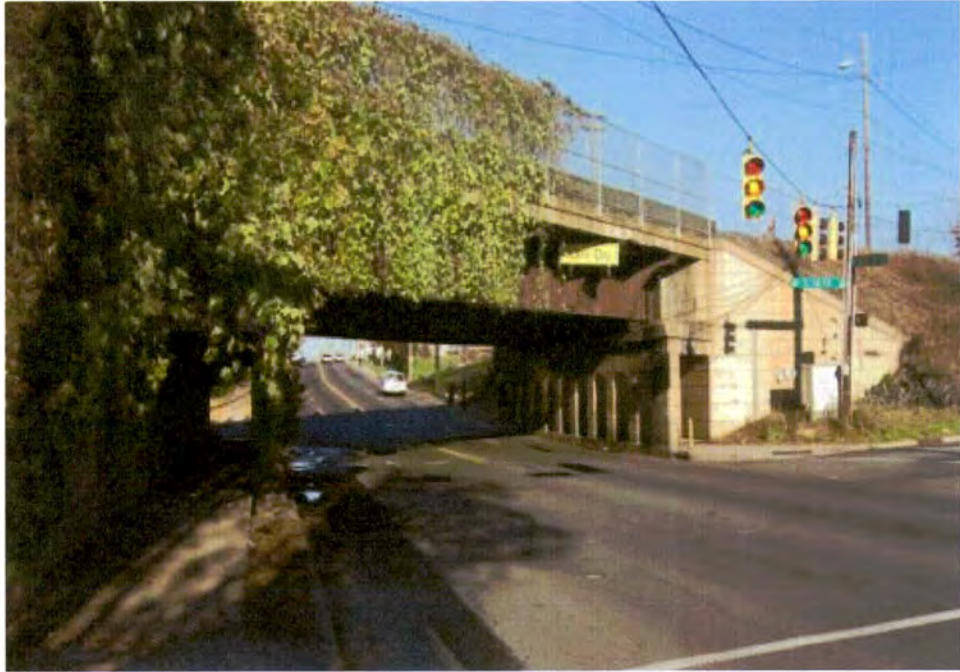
Southern Railway Bridge, North Tryon Street, Looking North.
